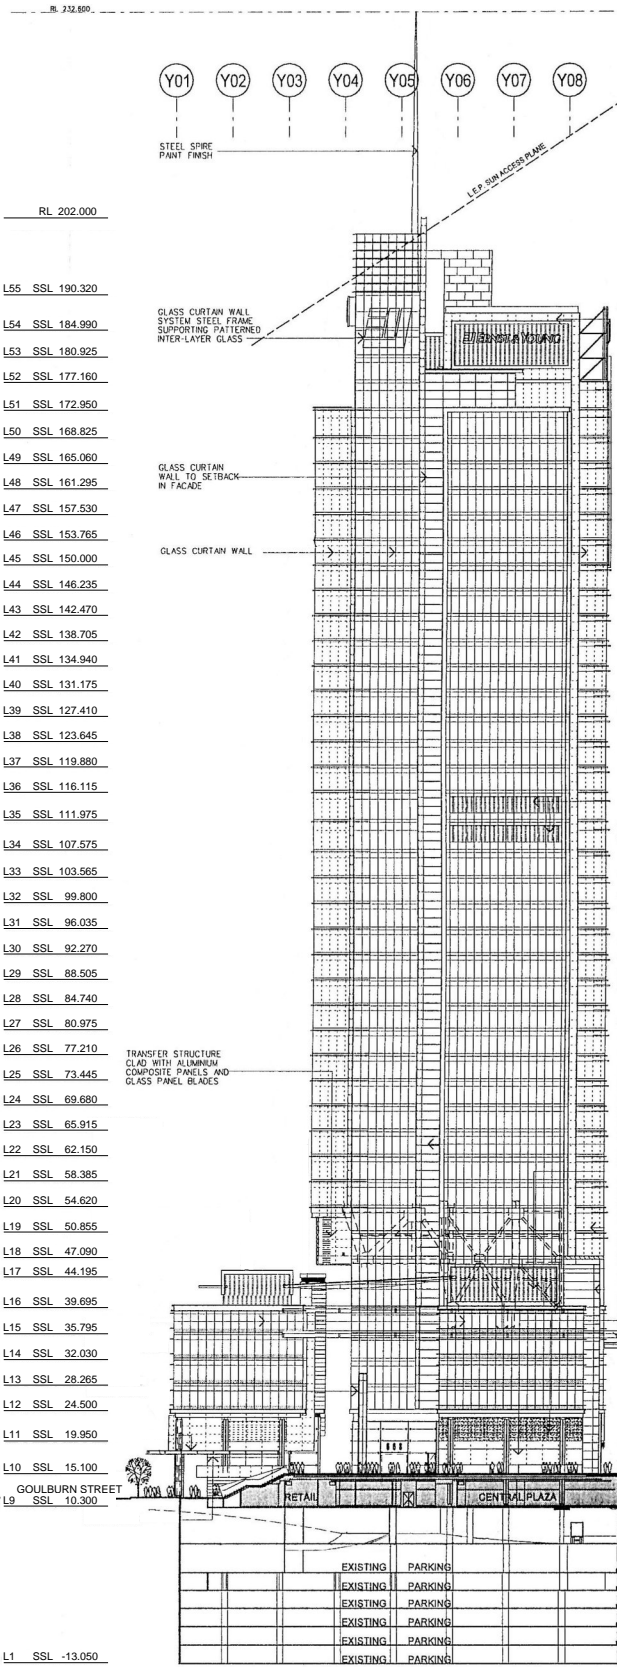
Eastern elevation of Latitude tower (Source: Crone Nation Architects)
